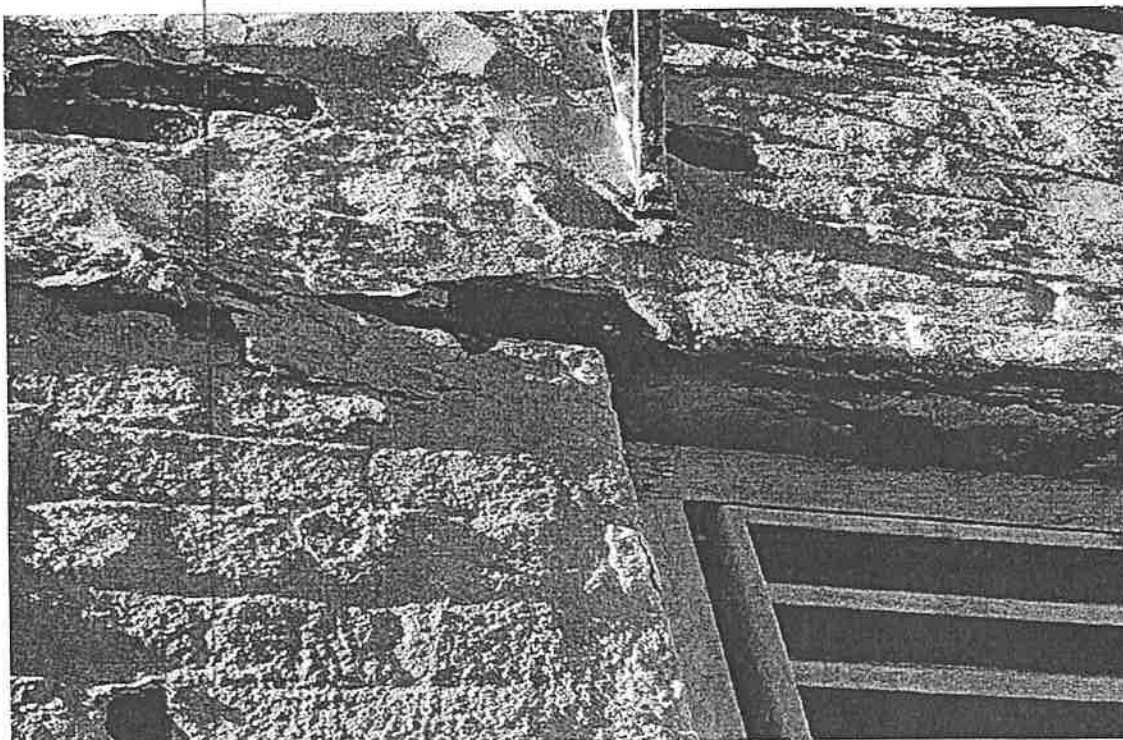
Corroded lintel at louver opening. Steel is bowed, delaminated and has caused damage to masonry at the jamb from rust jacking.
